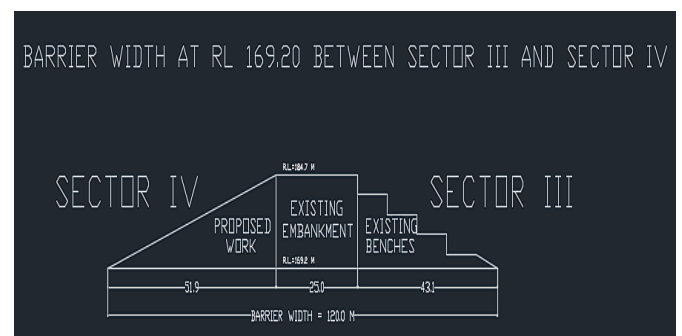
Proposed Barrier Width at RL 169.20 M
